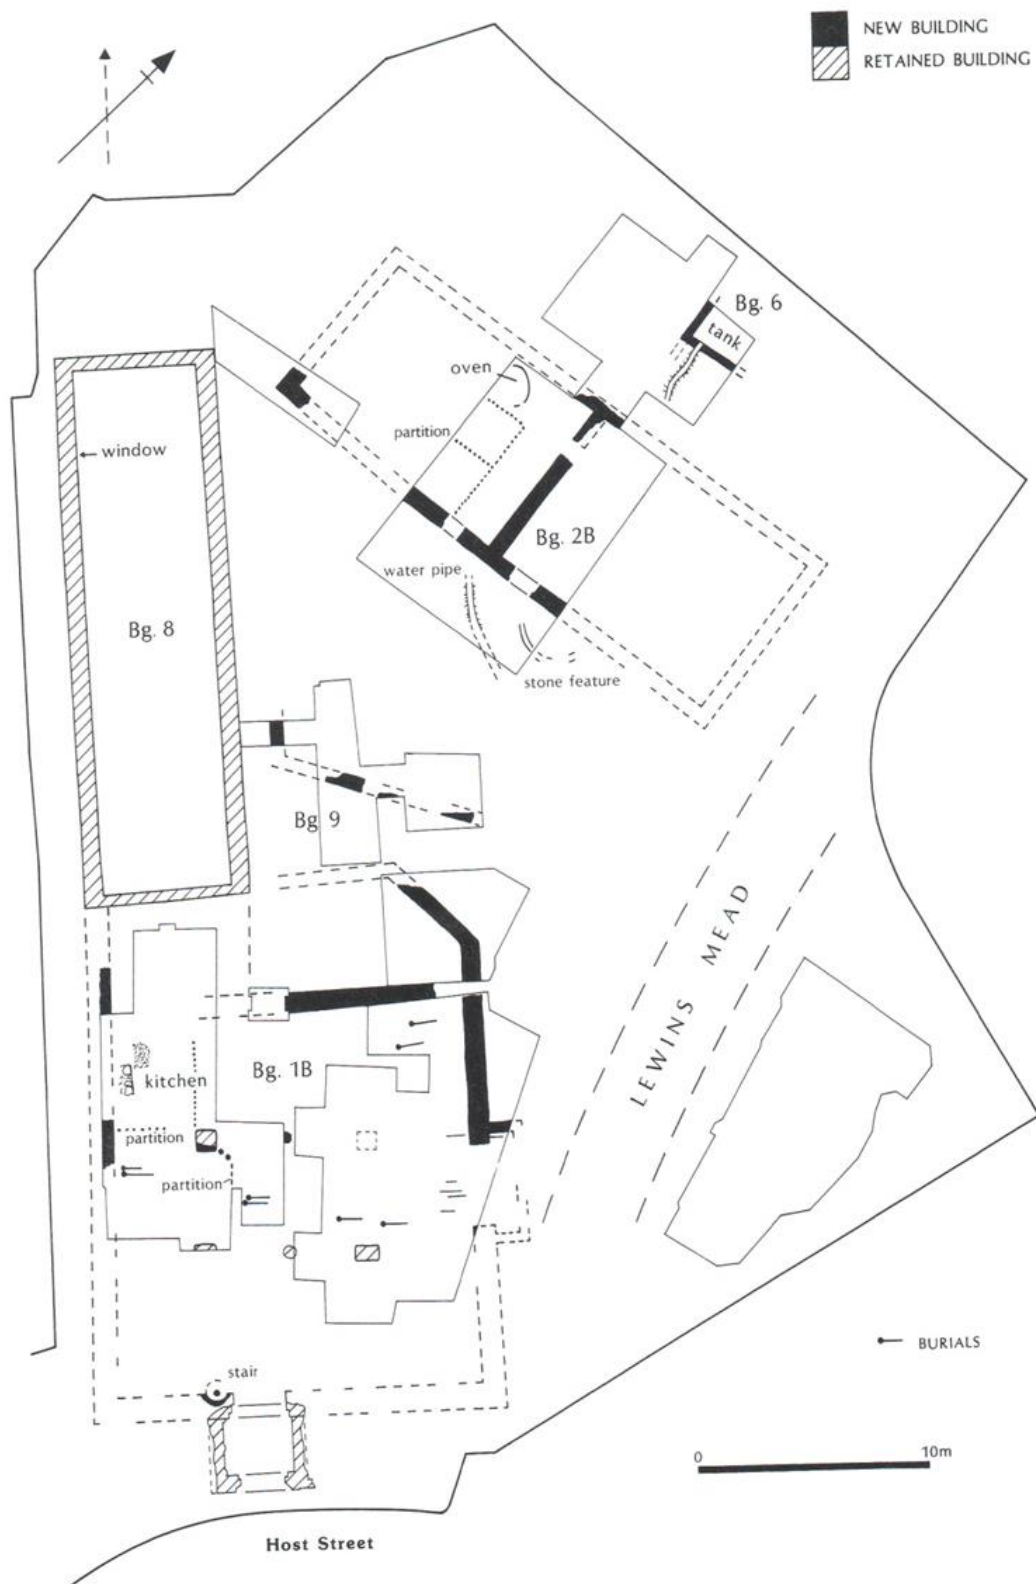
24: Summary plan of principle structures at St Bartholomew, 1340-1400. This period saw extensive modifications to the site, with the clear use of the Norman Hall (Building 1B) as a chapel, a new domestic range in Building 2B, and possible changes to buildings around the courtyard (Price and Ponsford 1998, 89, Fig 36) © Roger Price and Michael Ponsford
